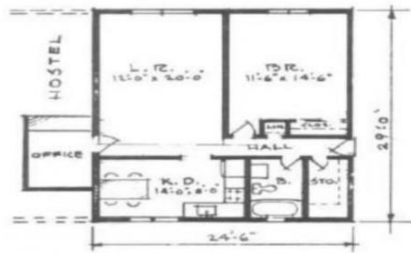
Typical apartment layout. Note: This is an average-size apartment. More space and room is always desirable. This is one of many possible layouts.
